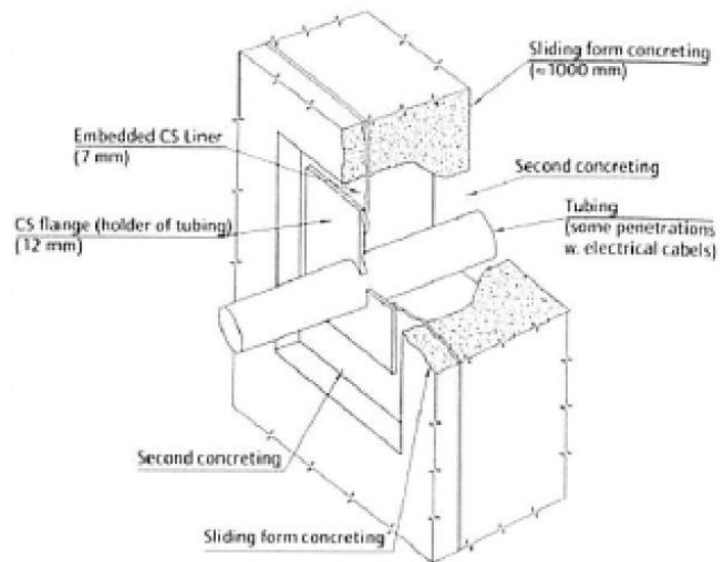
Principal concept of steel liner cutouts for casing pipes and manholes (Sandberg et.al., 2019).
